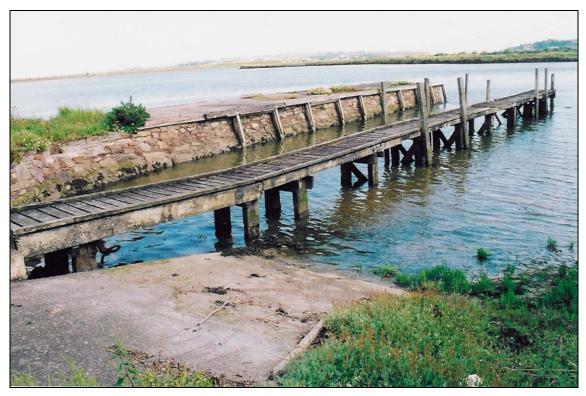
,  $\mathbf{AR32}$ , Stone Bridge Complex, Slipway, Jetty and Pier, looking southeast
